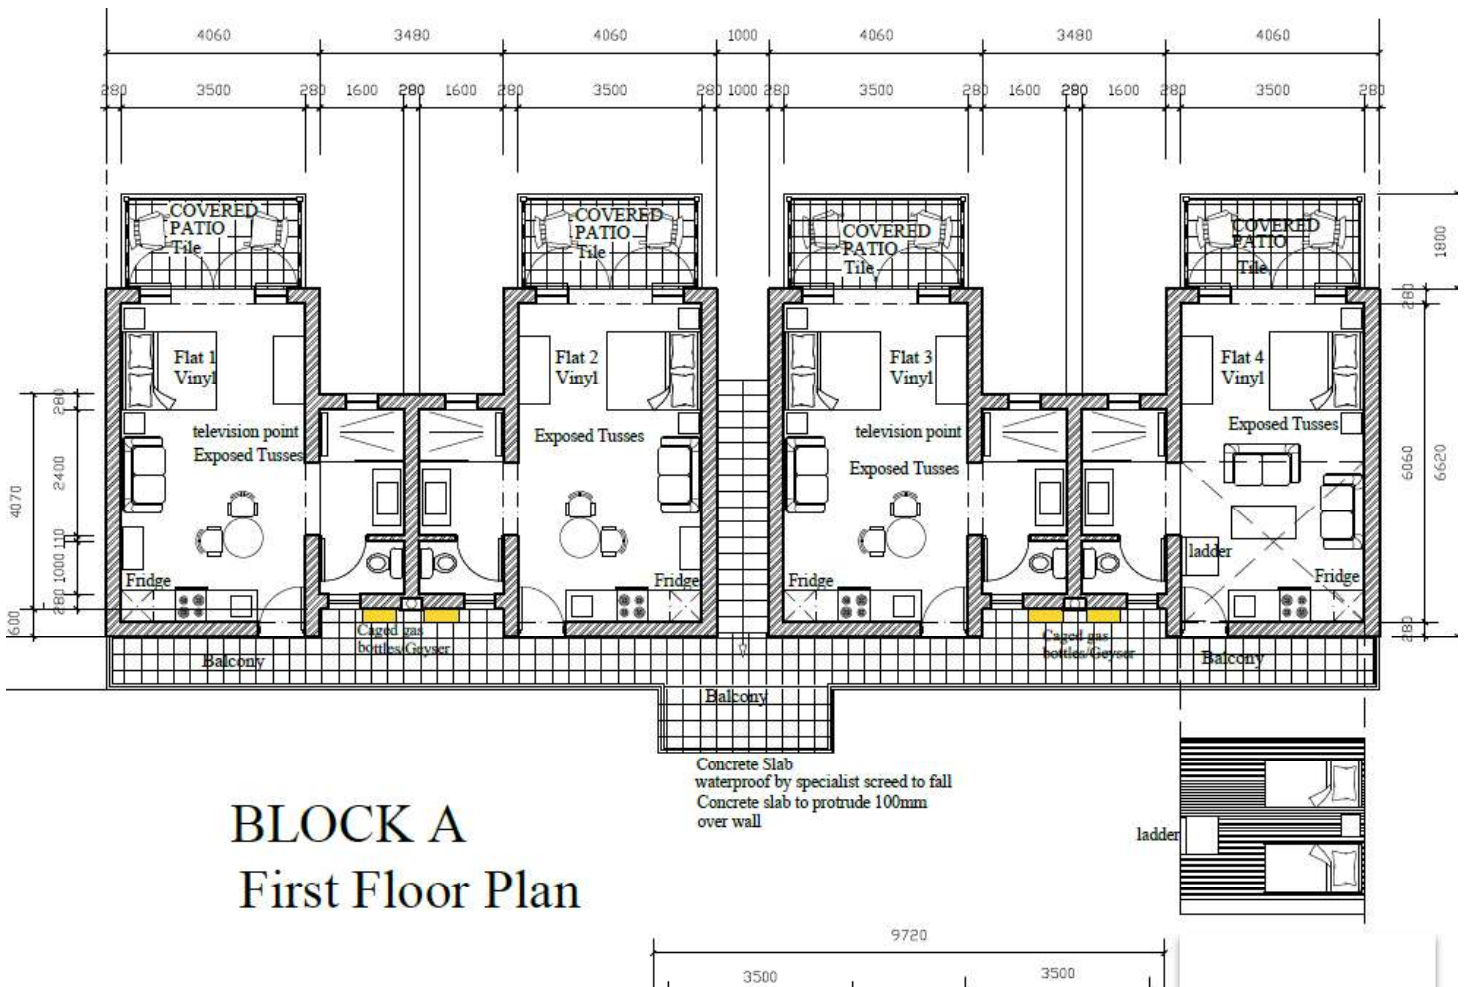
PROPOSED FIRST FLOOR BLOCK A
